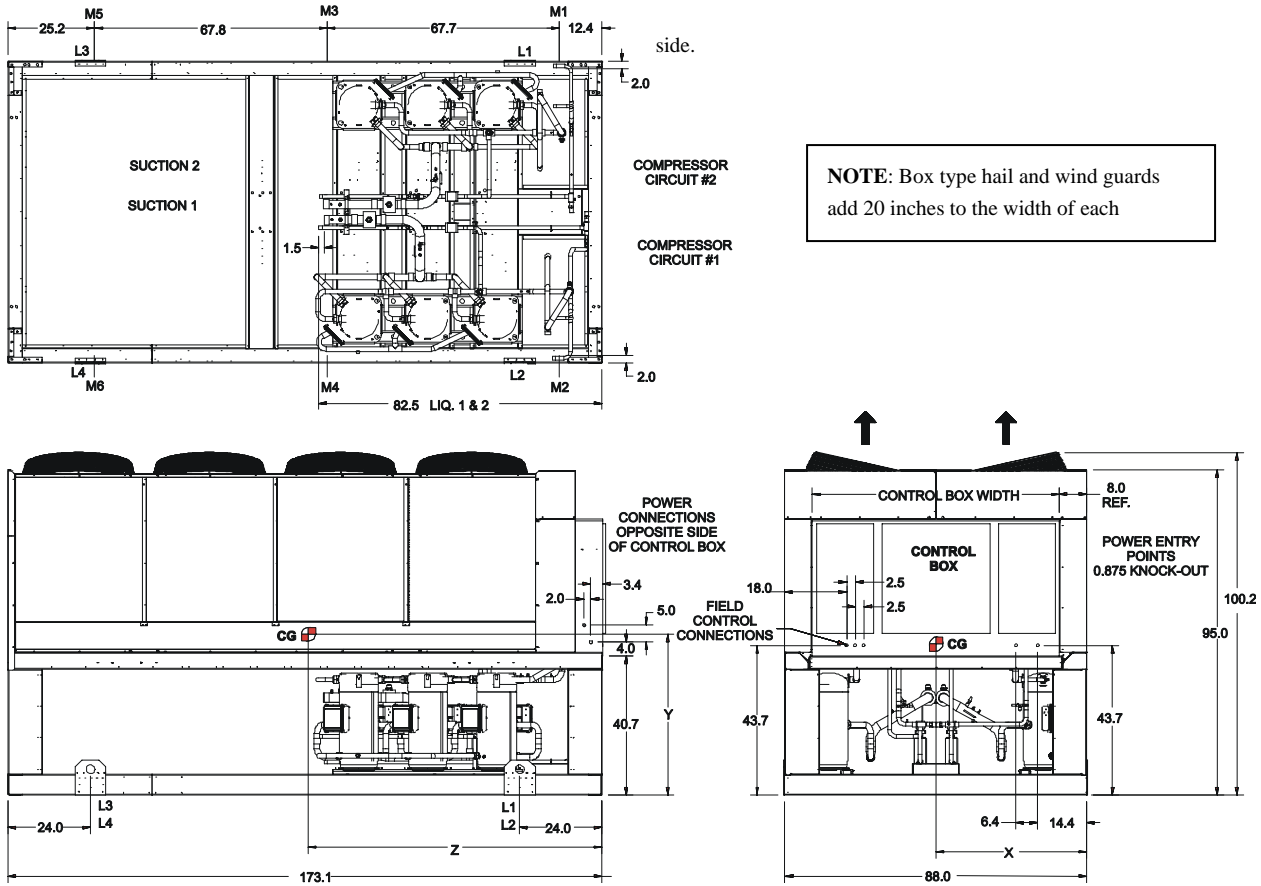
, Dimensions, AGZ 075CB – 100CB, w/ Remote Evaporator
